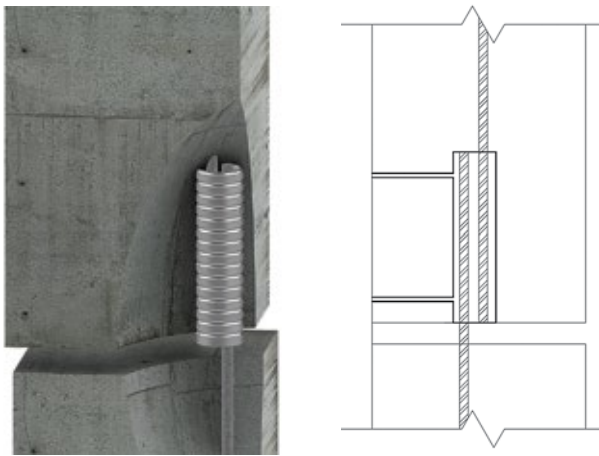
Rebar lapping in grout-filled hole formed with metal bellow
